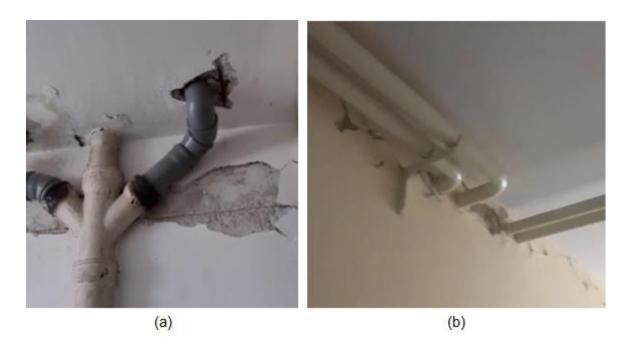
Examples of failures in piping systems in university building constructed in 1962 (Uciteljski fakultet) (source: Nenad Bijelić and Damir Lazarević).
